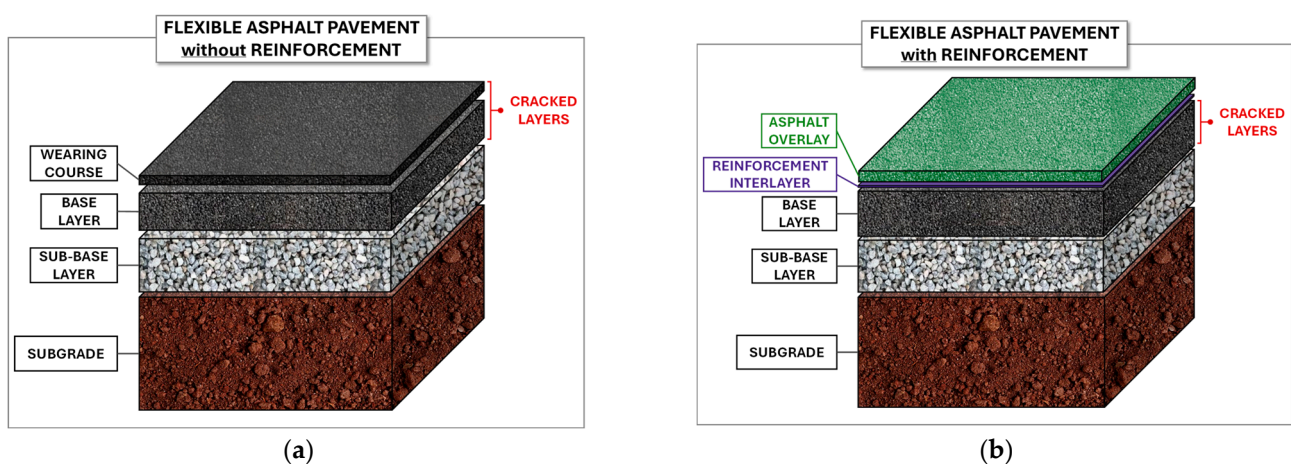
Analyzed pavement scheme: (a) without reinforcement; (b) with reinforcement.
